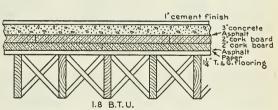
Typical floor construction for cold-storage rooms, and the coefficient of heat transfer in British thermal units
